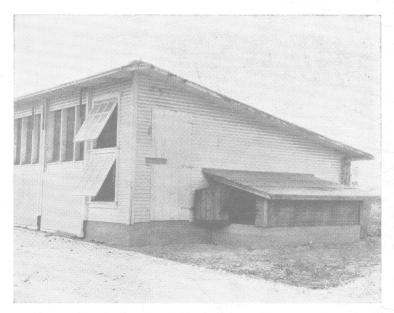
A small addition to the house, similar to this, is all that is necessary to house the heating unit for a poultry house. Fig. 9 shows the heating unit.
